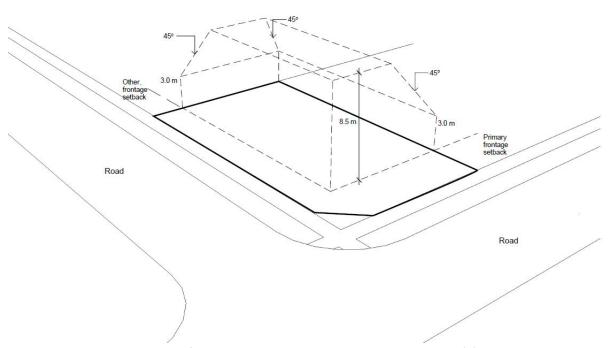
Building envelope for corner lots as required by clause 10.4.2 A3(a)
